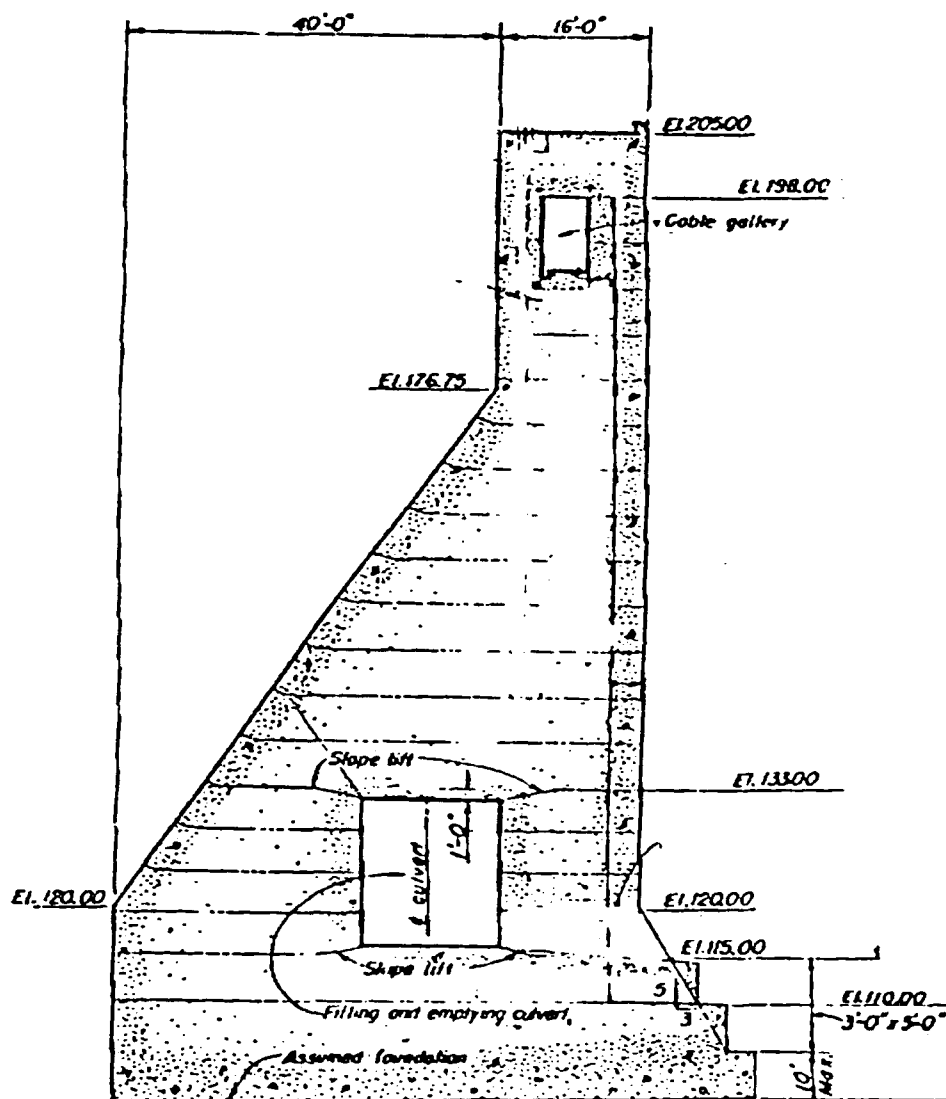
Typical cross section of chamber wall monolith on the north side at Snell Lock
